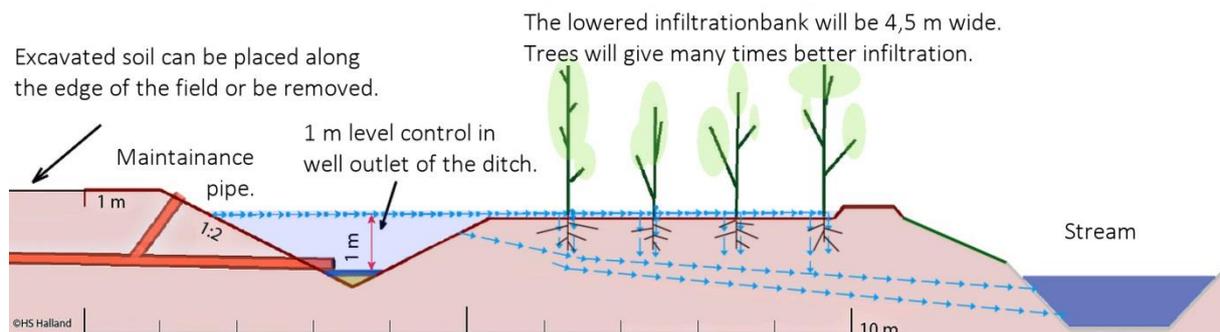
Section through a 10 m wide IBZ facility next to the stream.
